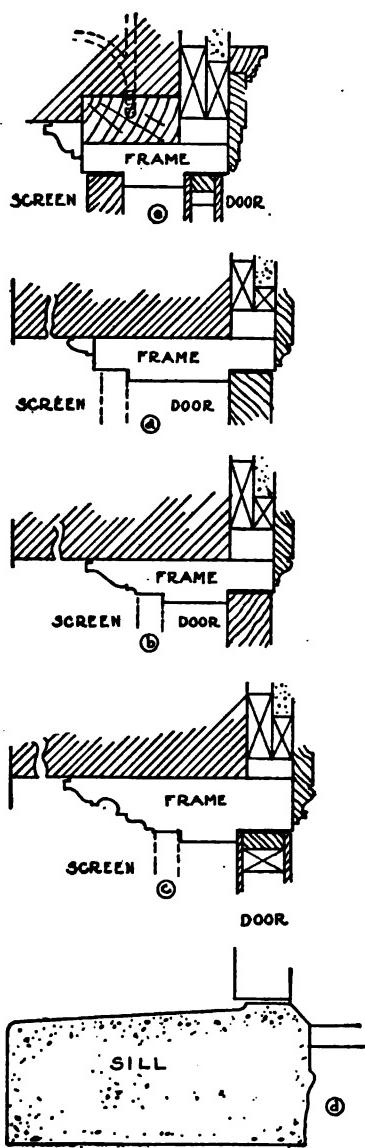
Outside-Door Frames and Stone Sill in Masonry Walls. *a, b, c*, Door Jambs. *d*, Stone Sill. *e*, Frame for Exposed Situations.
